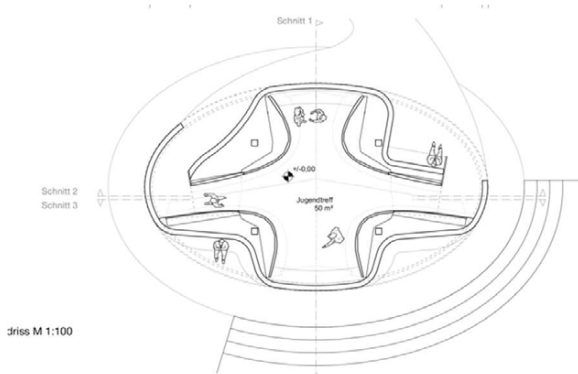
Floor plan and section Youth Center Ingersheim Vaihingen ©Stuttgart210
